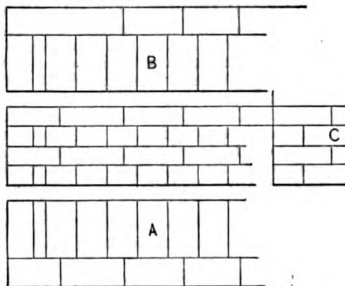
Elevation and Plan Views of a Wall a Brick and a-Half Thick.
